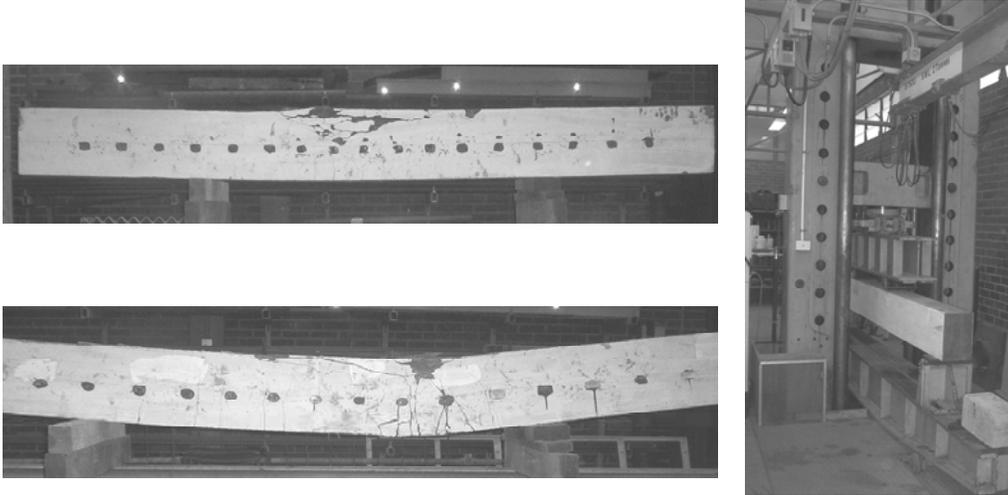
Testing setup of reinforced geopolymer concrete beams.
